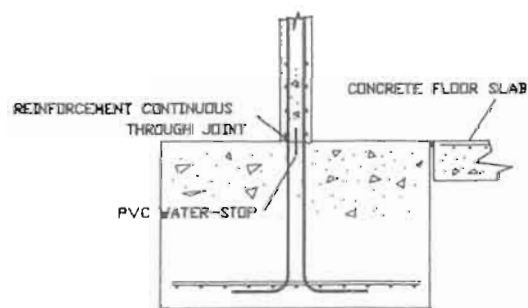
Detail of typical rigid connections at the top and bottom of a concrete silo wall. Note PVC water stop in gas sealing joint.
